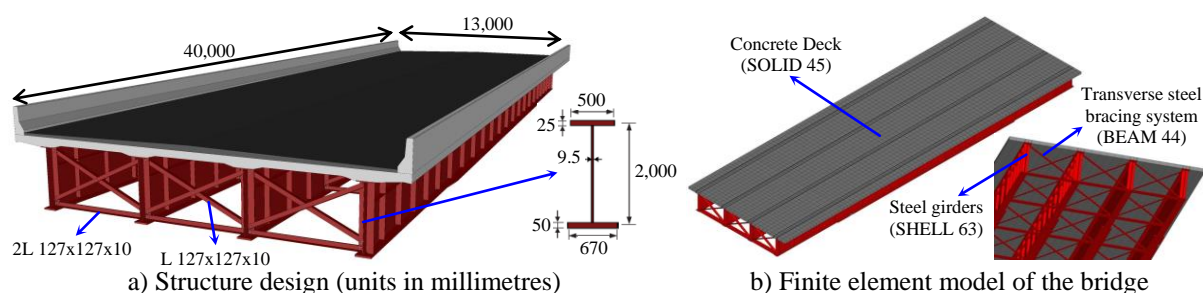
Investigated simply supported steel-concrete highway bridge deck
